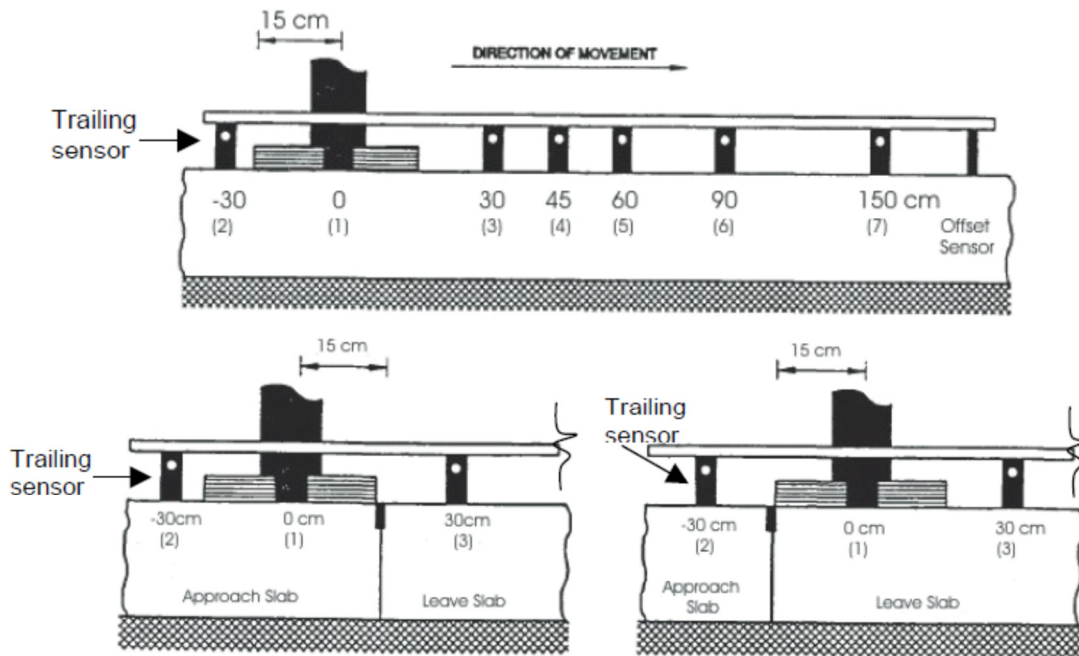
Typical FWD Sensor Spacing for Rigid Pavement Load Transfer Test [Chan & Lane, 2005]
